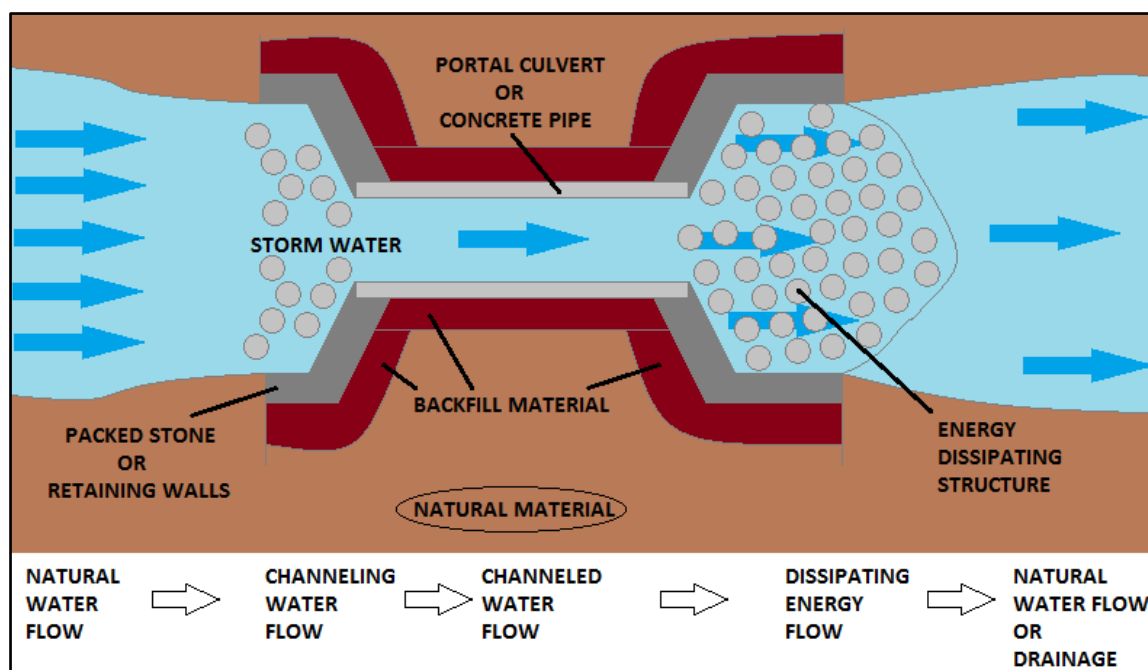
Schematic example of typical drainage line crossing (Solek, 2014)
